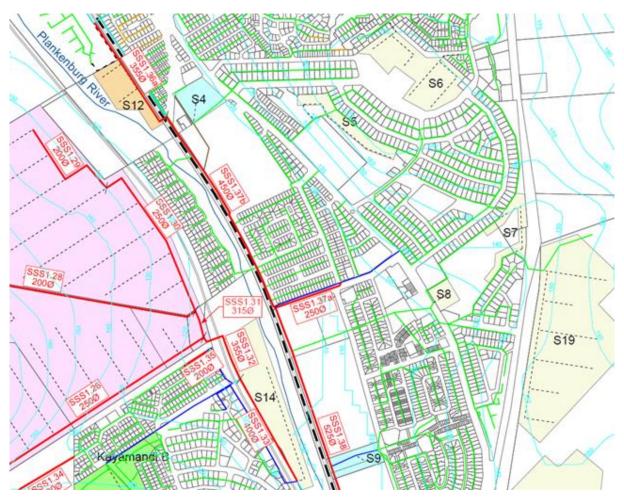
Bulk Sewer Upgrades (GLS Master Plan)
